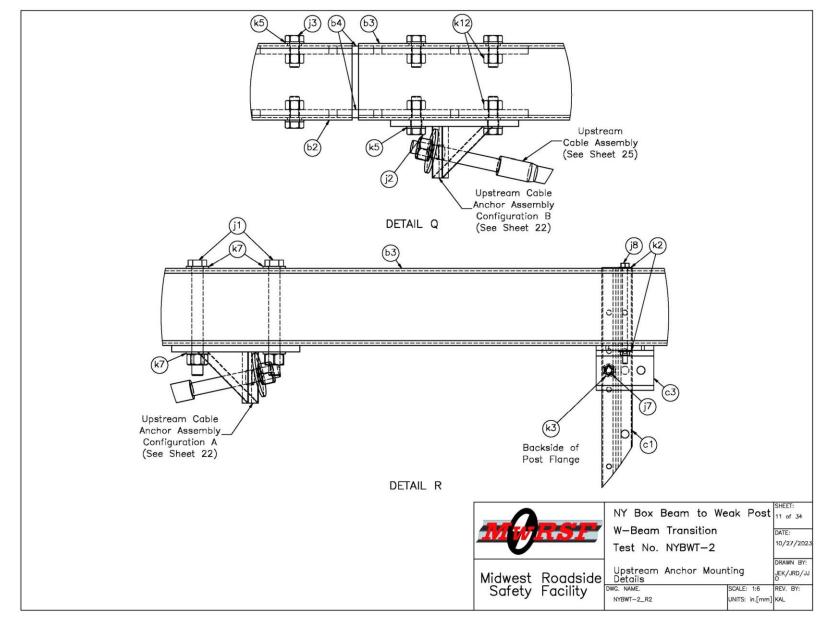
Upstream Anchorage Details, Test No. NYBWT-2
